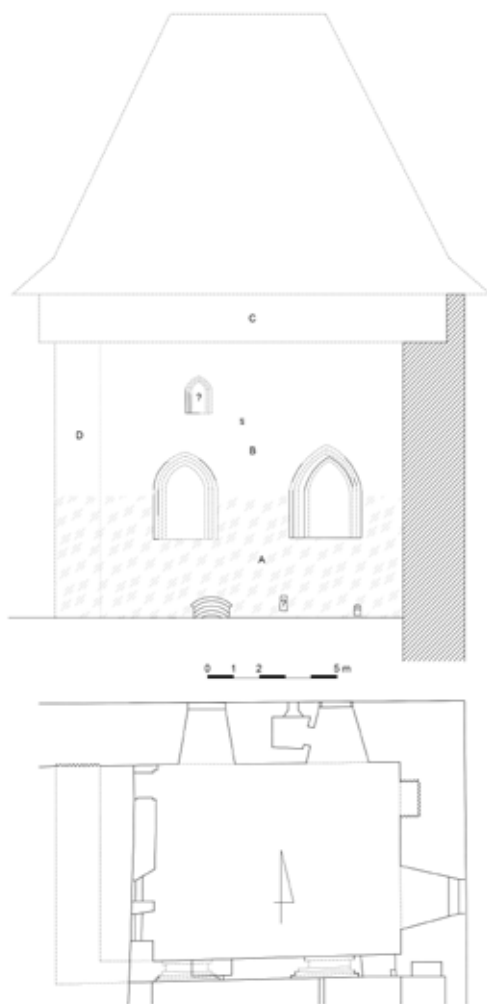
Theoretical reconstruction and the ground floor plan of the former chapel at Swobnica (14–16th c.). Dashed line – reconstruction, [A] stone and brick wall, [B] brick wall, [C] attic (timber-framed?) [D] unpreserved part of the building (drawing: K. Wroński)
